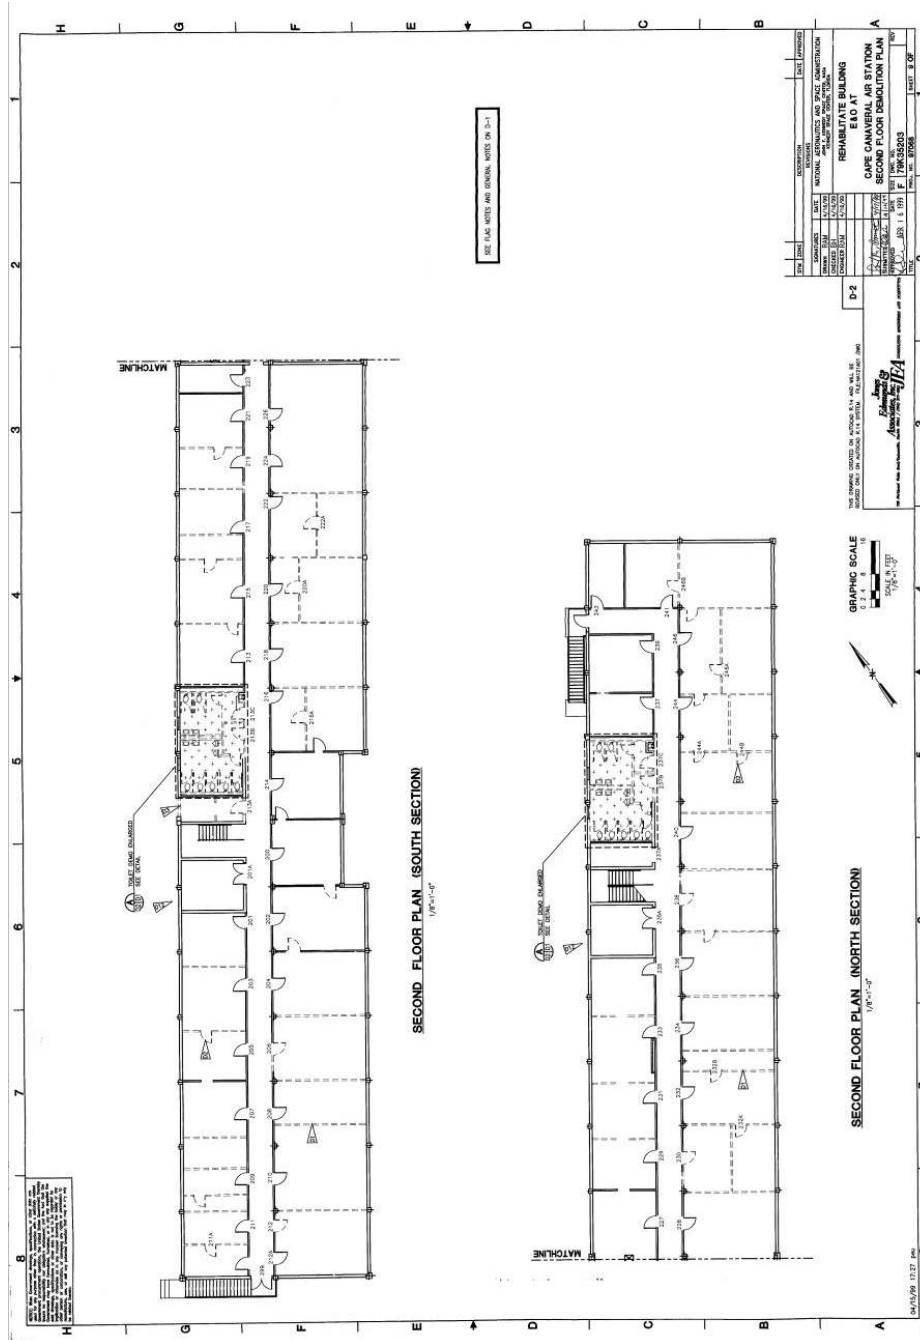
Jones, Edmunds & Assoc., Rehabilitate Building E&O at Cape Canaveral Air Station, Second Floor Demolition Plan, April 1999, Sheet 9.
